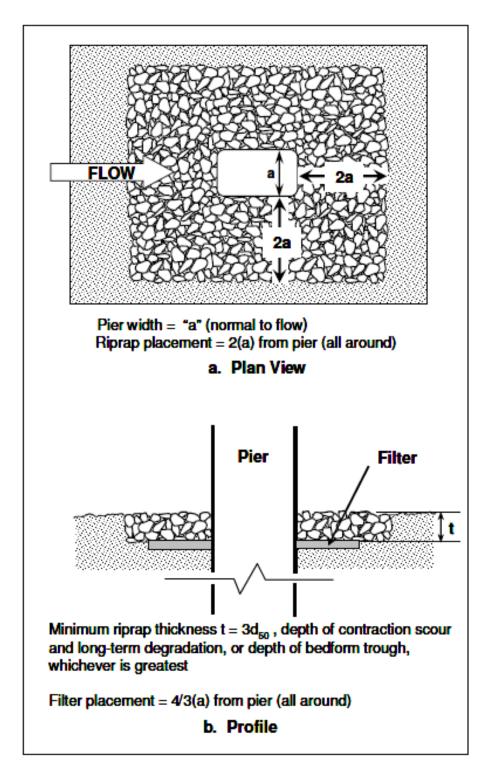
Riprap Layout Diagram for Pier Scour Protection (Figure 11.15 from Ref. 6)
